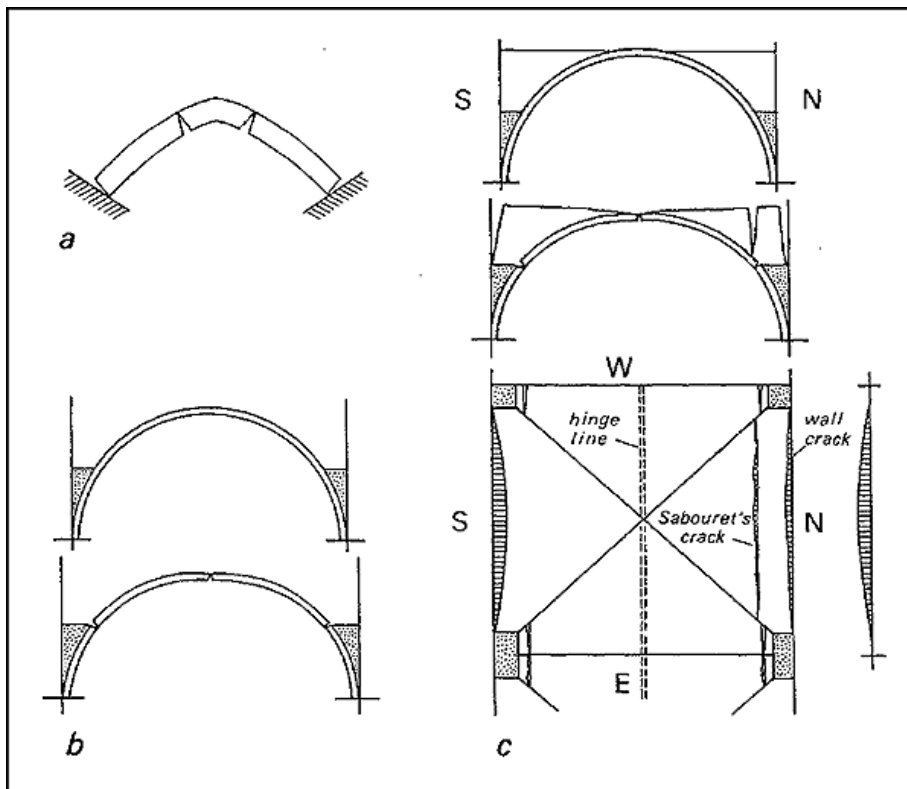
Crack development: (a) pointed arch; (b) barrel vault; (c) quadripartite vault
